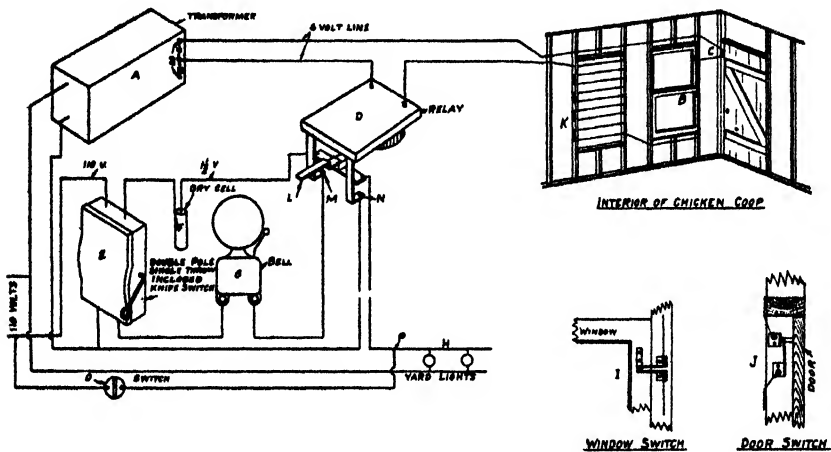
Diagram showing how the burglar alarm is wired and the parts used.
